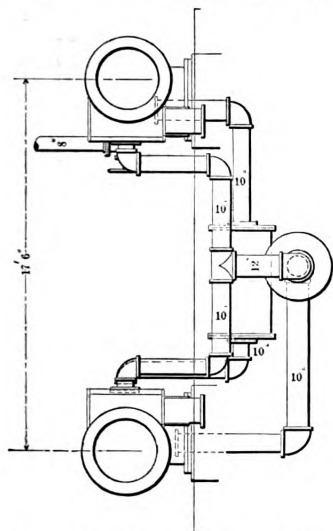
Sectional Elevation Fig. 2, Showing Piping.
